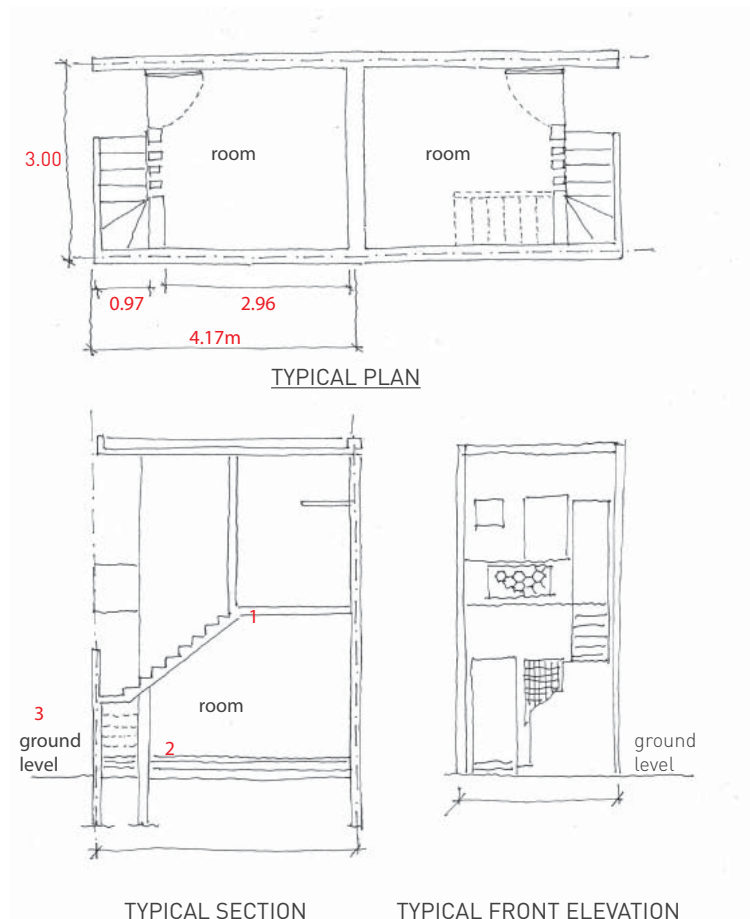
MCD HOUSING STANDARD. These plans and section stipulate a maximum building height of two stories with a permissible additional half structure on the roof, capping the building height to two-and-a-half stories.
